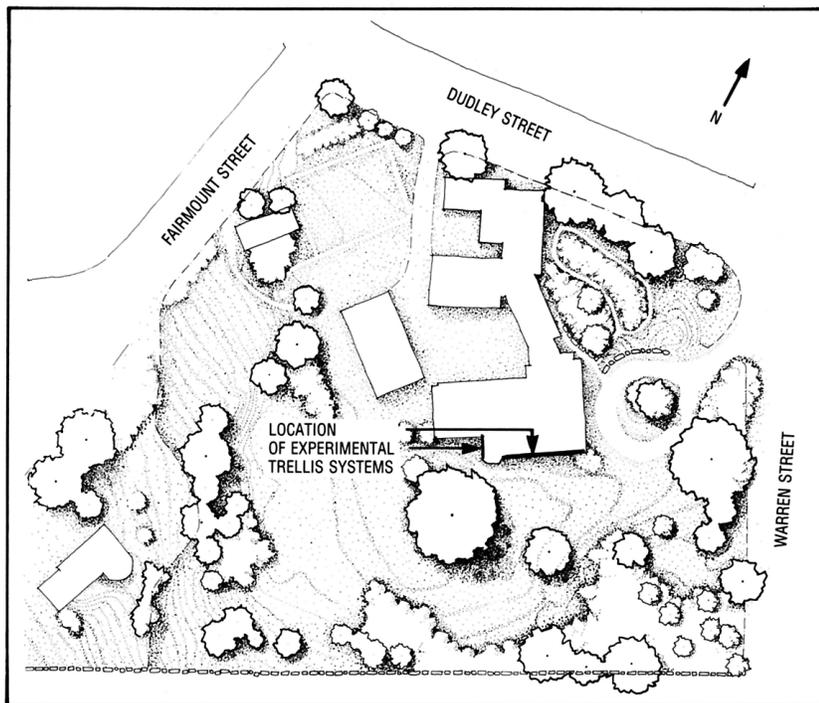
Site plan of Fairsted; the experimental trellis systems were installed on the south and west elevations. Drawing by Karen Day.
